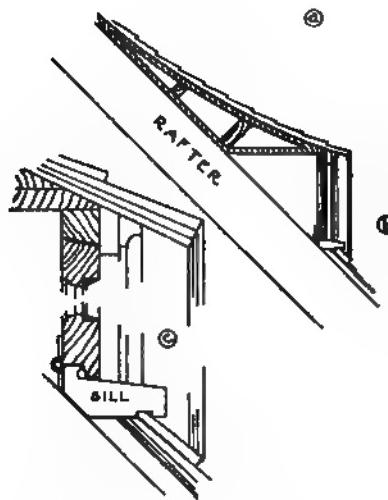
Framing of Eyebrow Dormer. a. Elevation. b. Section. c. Detail.
